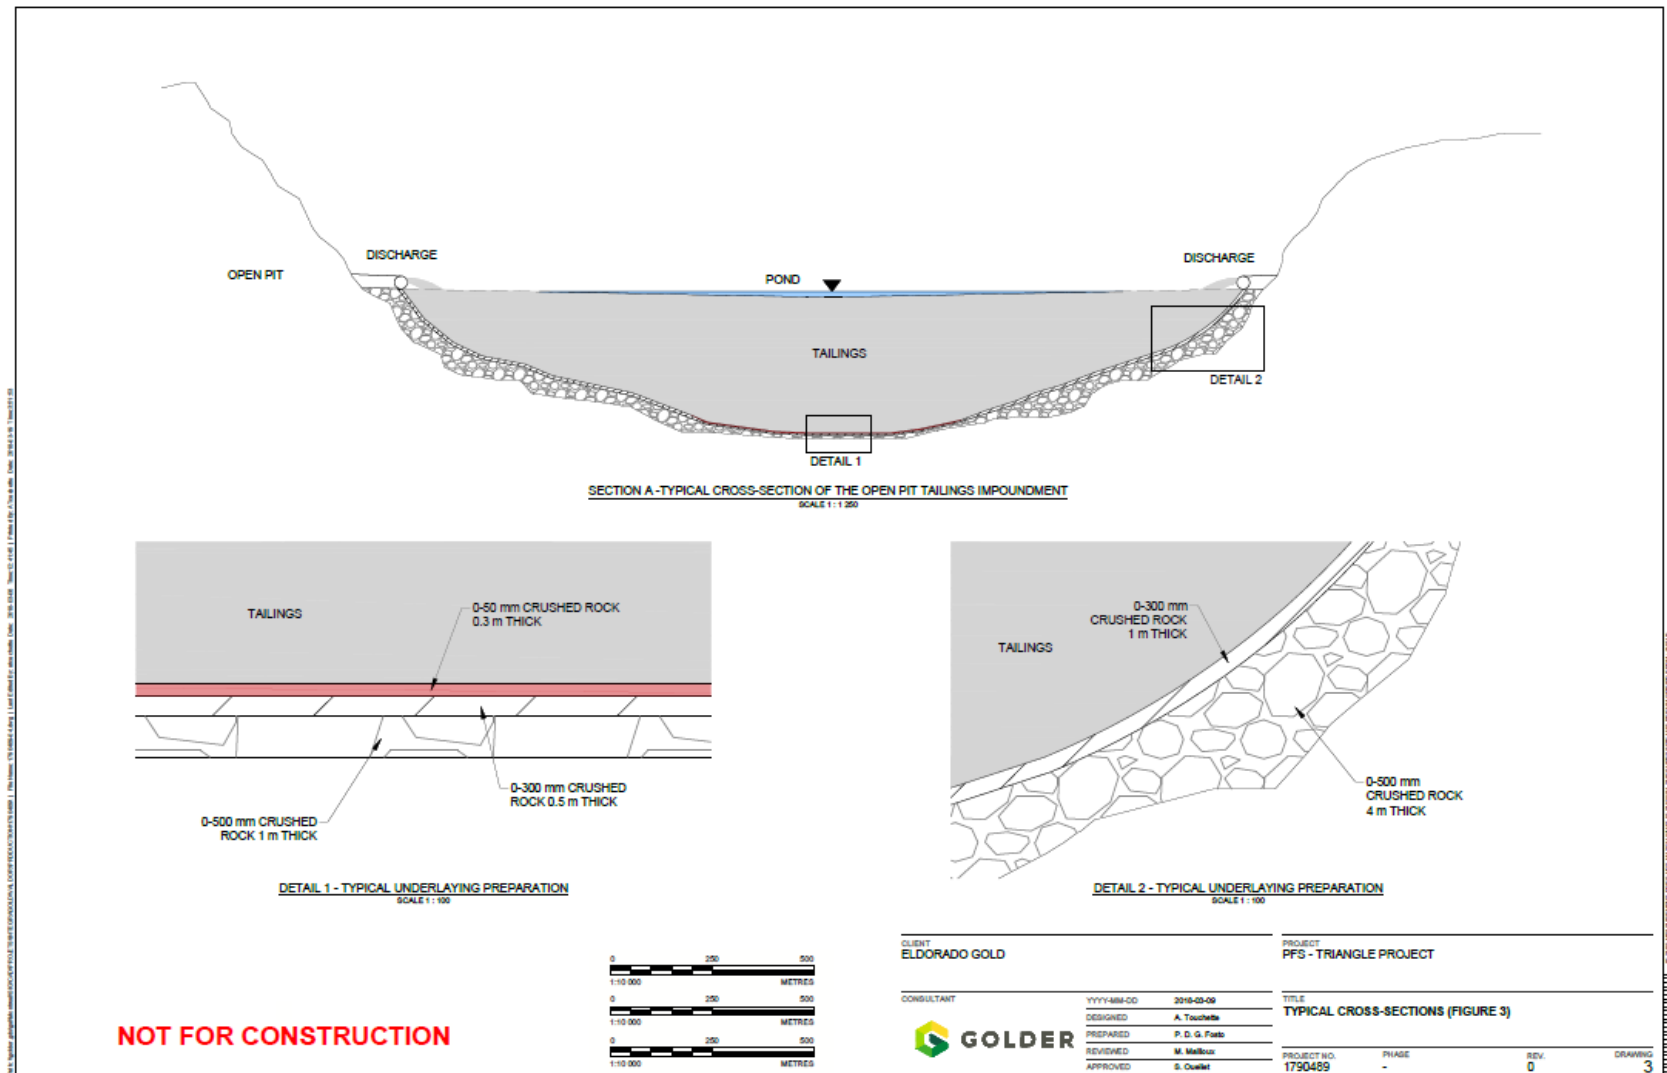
Typical Cross-Section of the Pervious Surround
